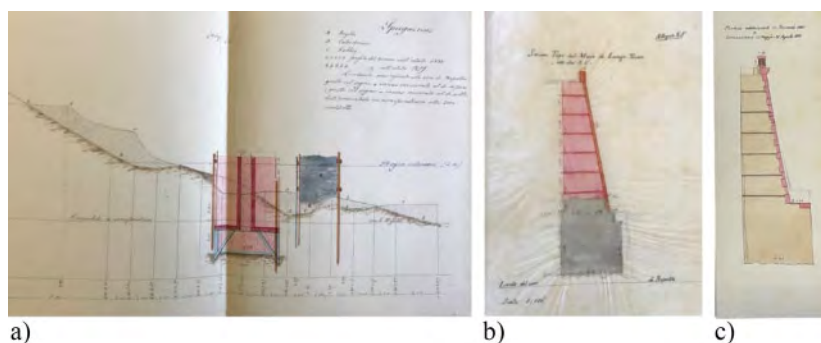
a) study for the use of pneumatic foundations, 1877; b) first design of the retaining walls with bricks coating, 1876; c) execution design of the retaining walls with travertine coating and pneumatic foundations, 1882 (courtesy Rome State Archive, Genio Civile collection).
